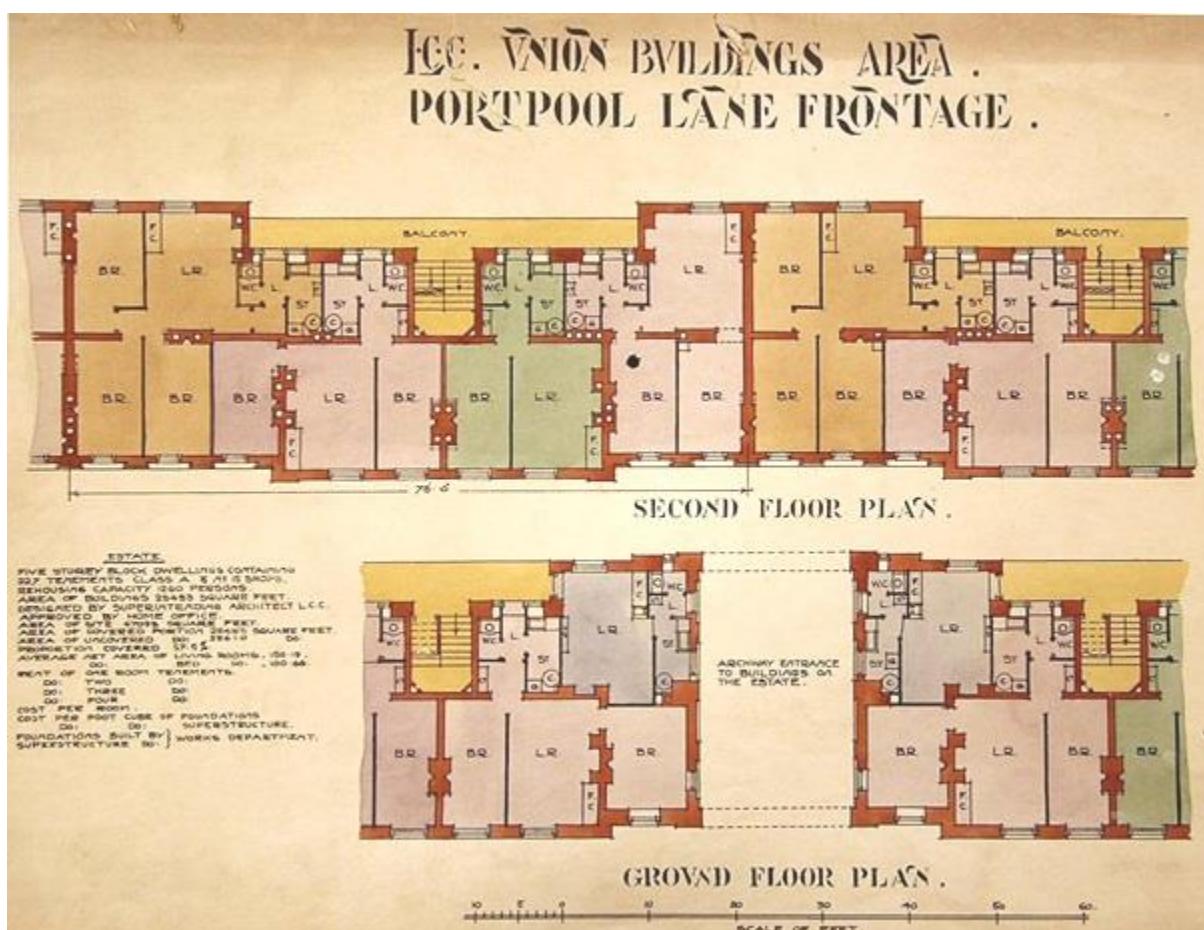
Union Buildings. Compare to earlier Bourne Buildings in Fig. 4 below
